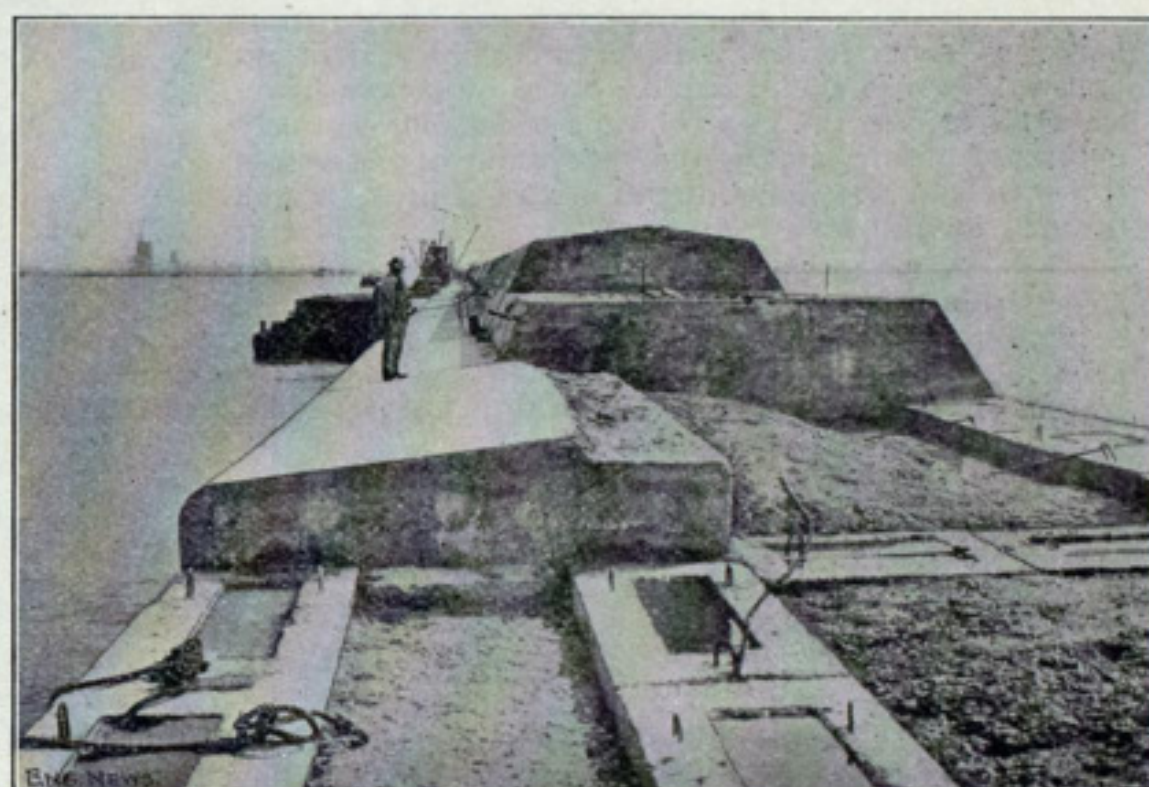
Concrete superstructure in successive stages of construction—concrete blocks, banquette, parapet walls and deck.
